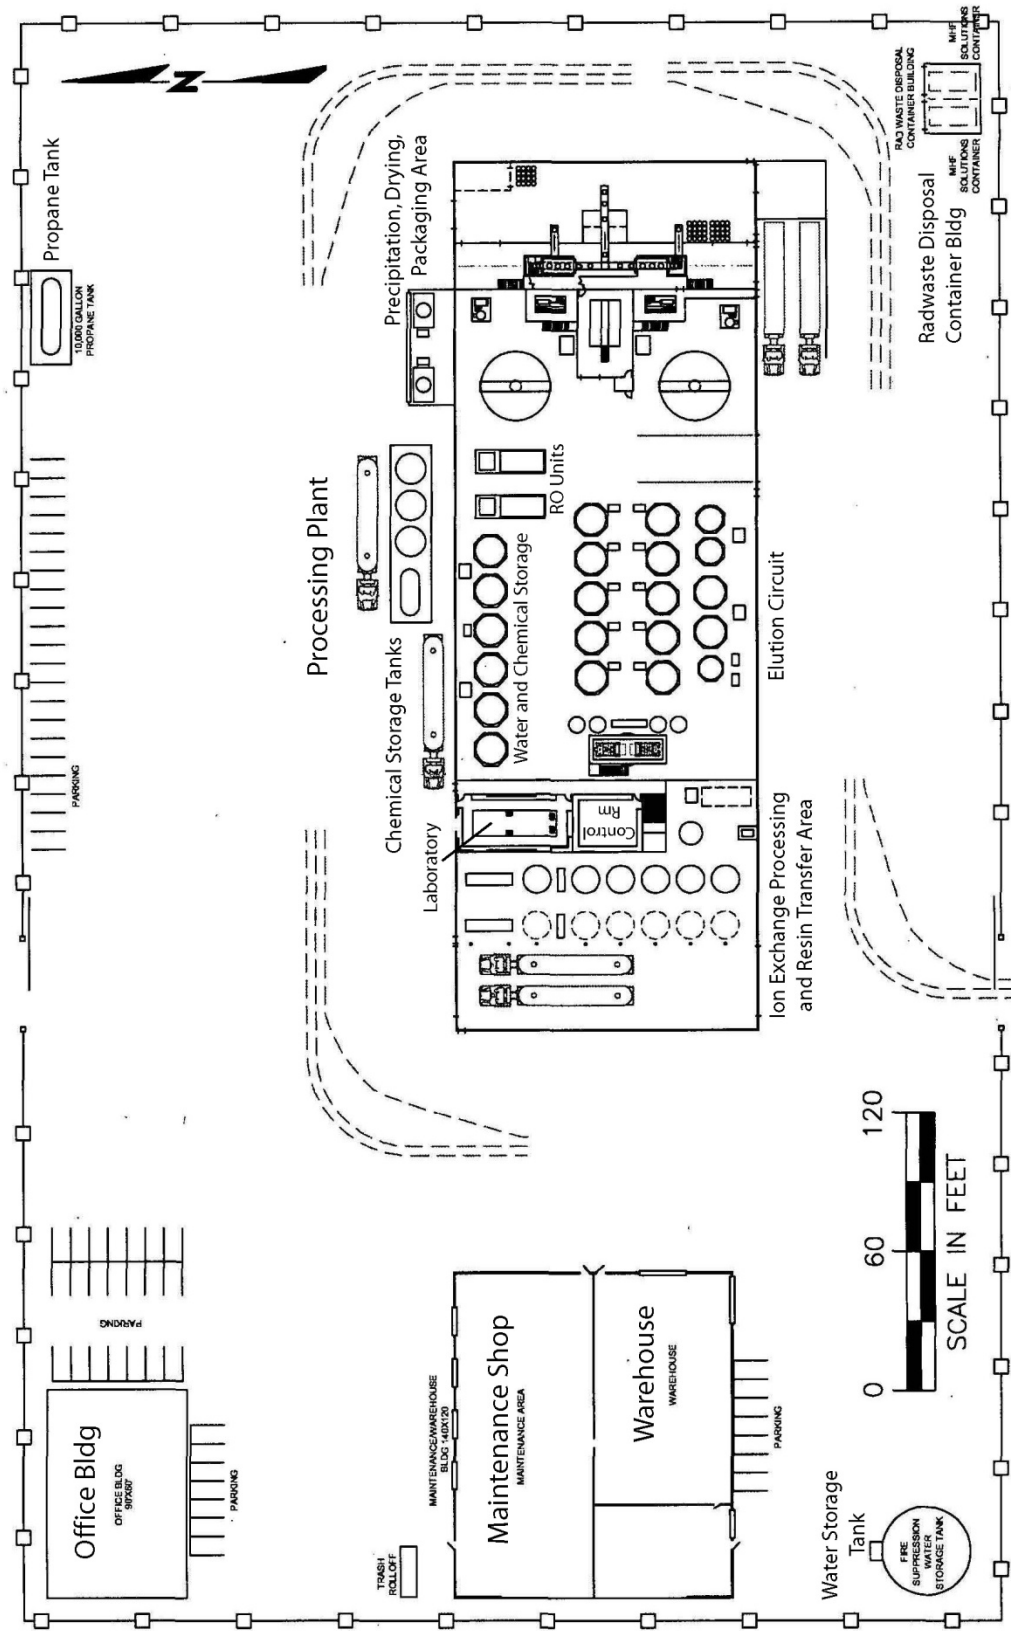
General Site Plan for the Burdock Central Processing Plant. Source: Modified From Powertech (2009b).
